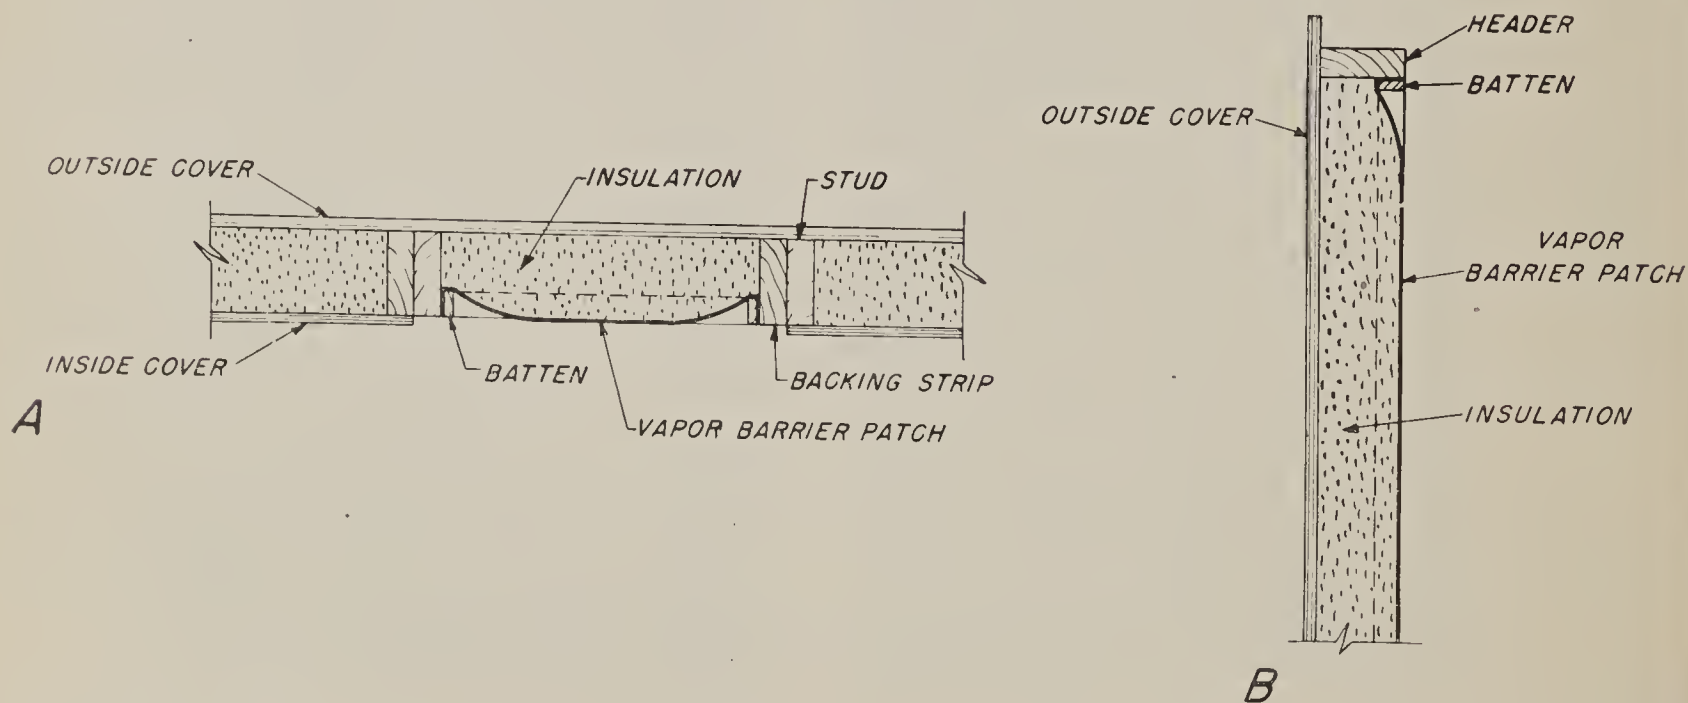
Method of vapor barrier replacement when inside cover is removed from stud to stud entire length of panel. A, horizontal cross section; B, vertical cross section of panel.
